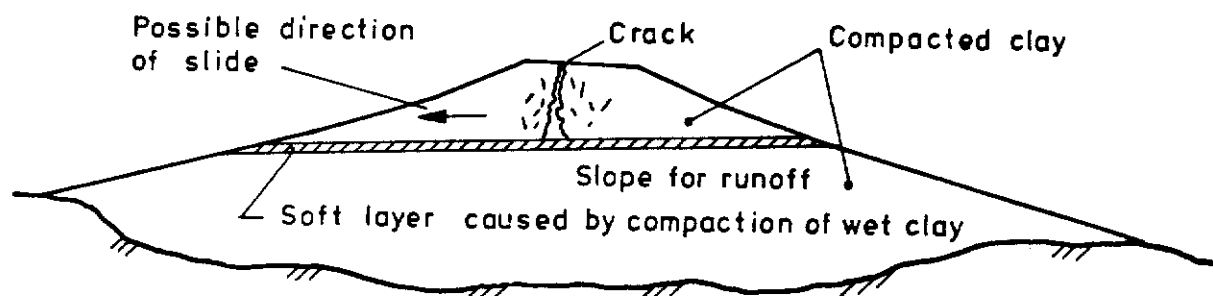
Effect of heavy rainfall on stability on a short term basis.
